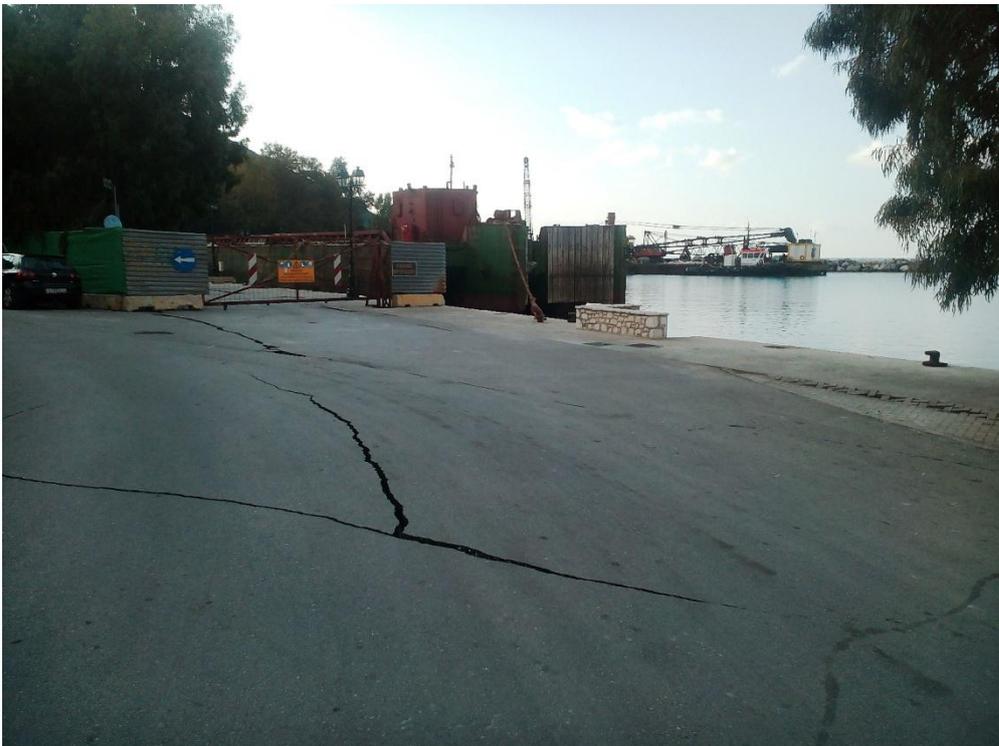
Field photo of asphalt cracks at Vassiliki port. View to the south. Date photo was taken 20 Nov. 2015.
